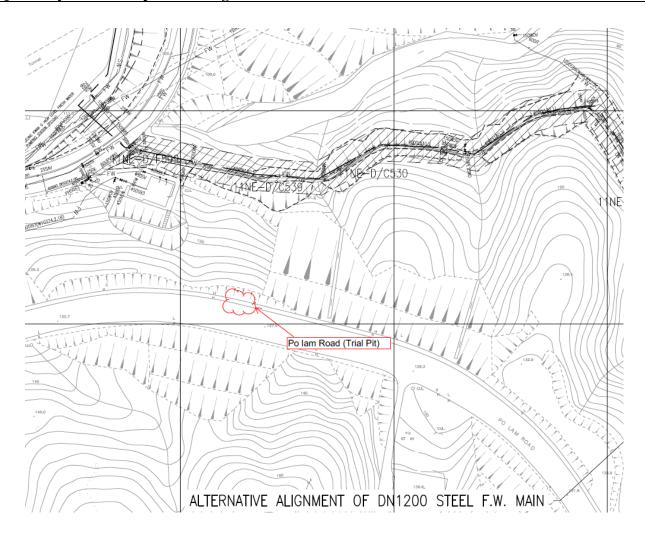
Location Plan for Portion J – Po Lam Road (PLR 1)
